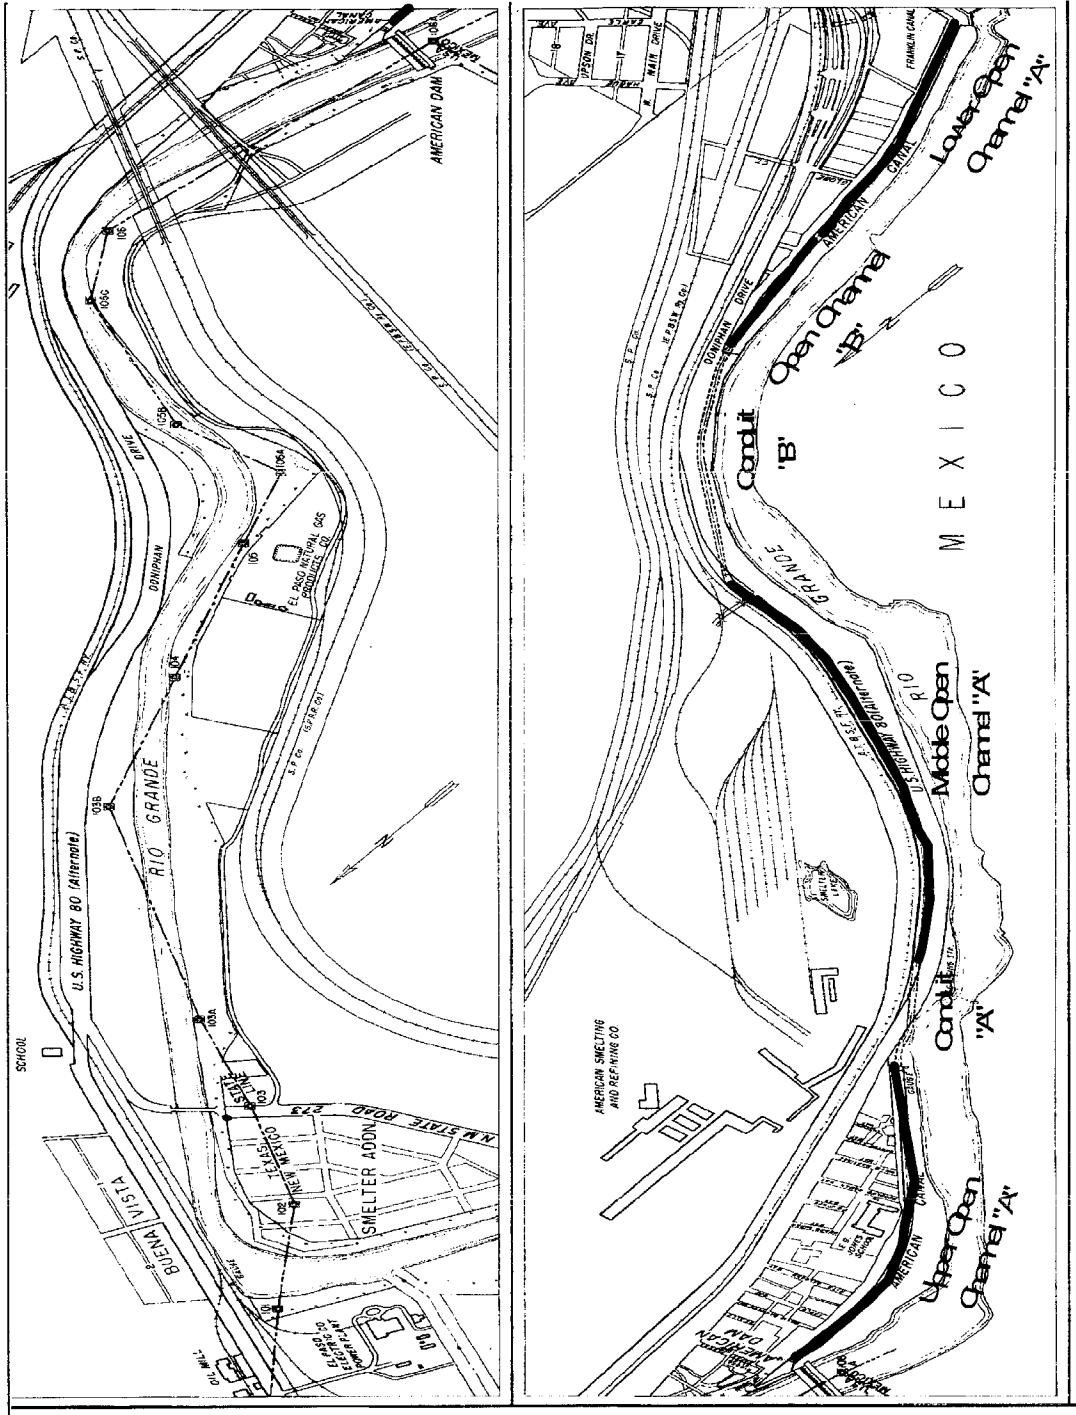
Strip Map of American Canal Showing Open Channels and Conduits (From U.S. Bureau of Reclamation, Irrigable Area and Property Maps, Sheet 1, 1961).
